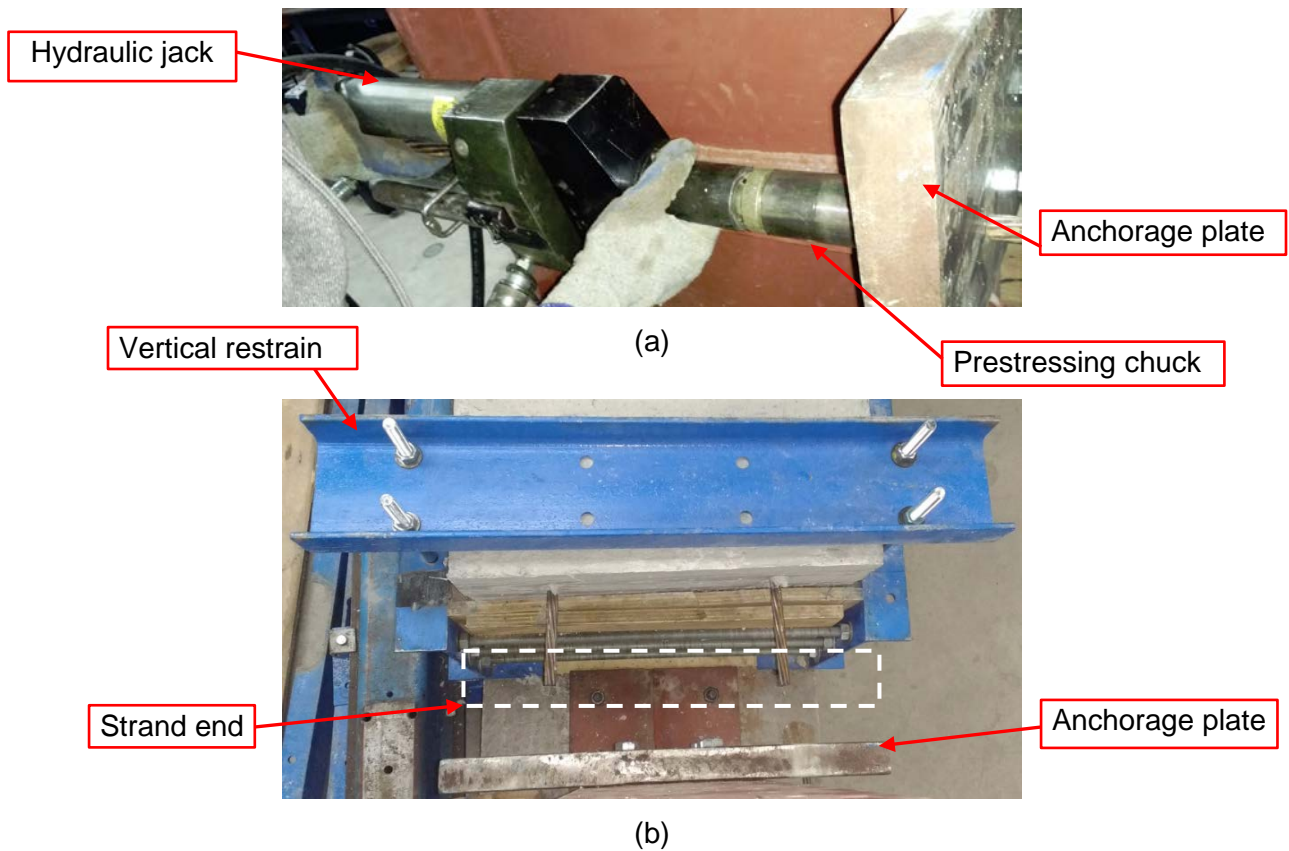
Prestressing procedure (a) and specimen boundary condition after strand cutting (b) (Specimen 4).
